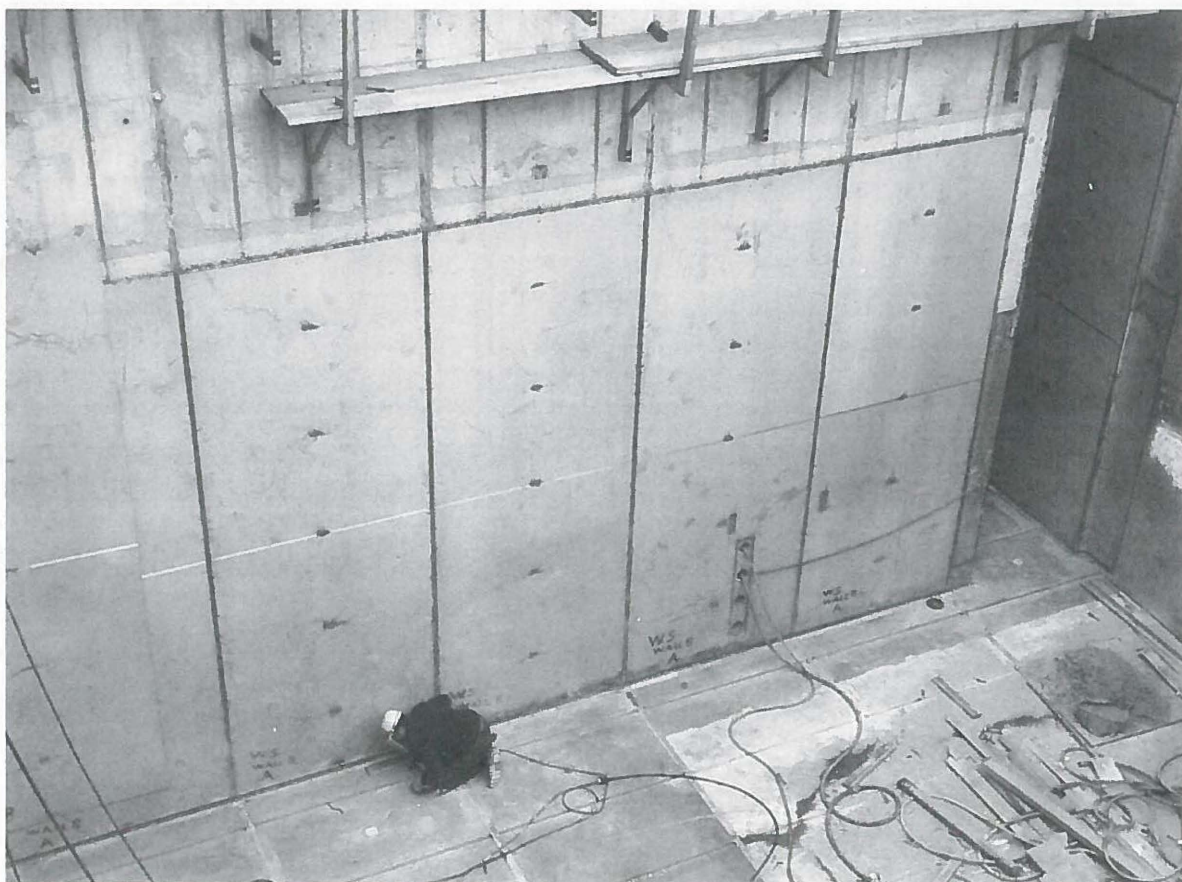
Stainless Steel Basin Liner. Both storage basins and the unloading basin are completely lined with stainless steel sheets (304L) placed flush against the concrete walls and floor, welded to a grid of stainless steel embedments.
